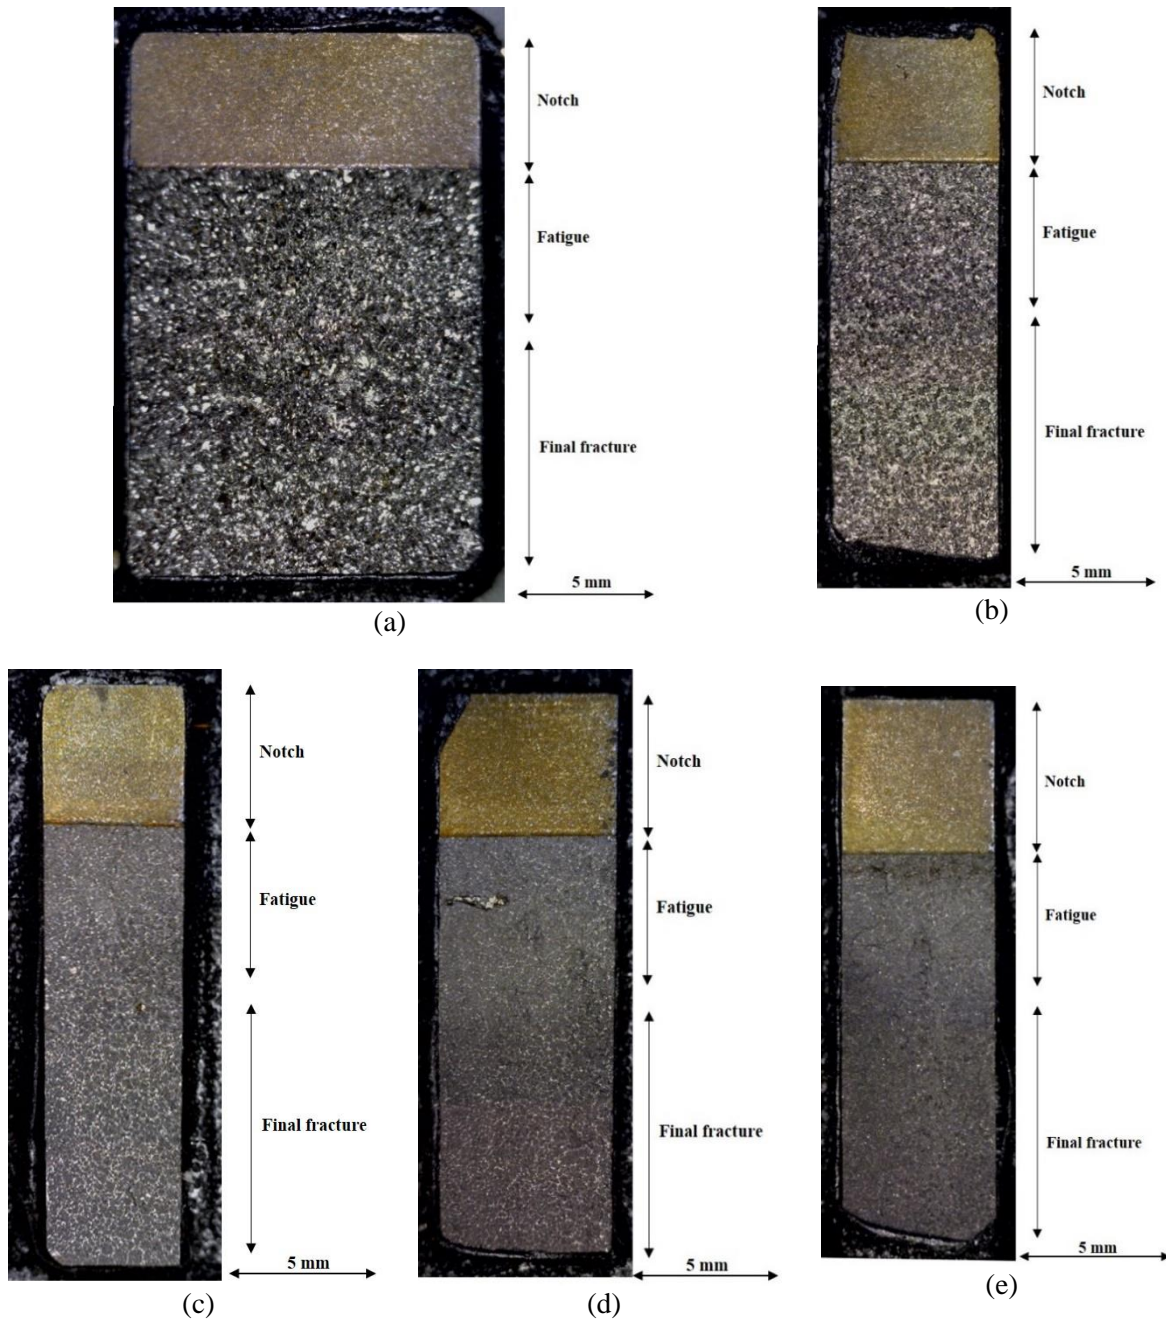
7 Fracture surfaces of FCGR specimens of CI water pipes: (a) Pipe 1; (b) Pipe 2; (c) Pipe 3; (d) Pipe 4; (e) Pipe 5
